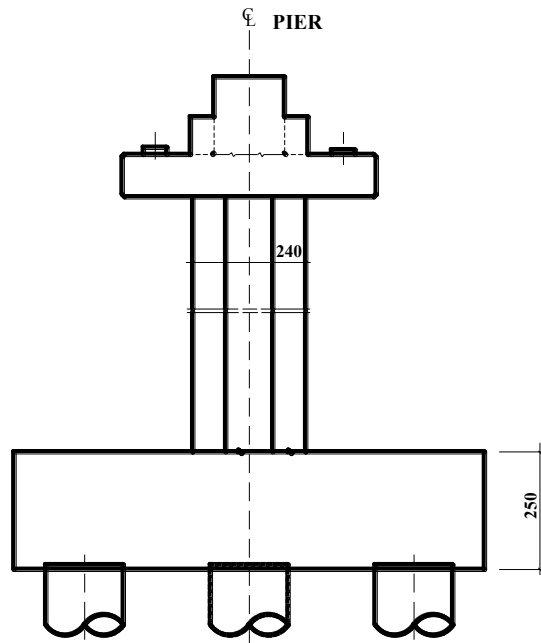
Elevation View of Cap-Beam Column Cross Section (cm)
